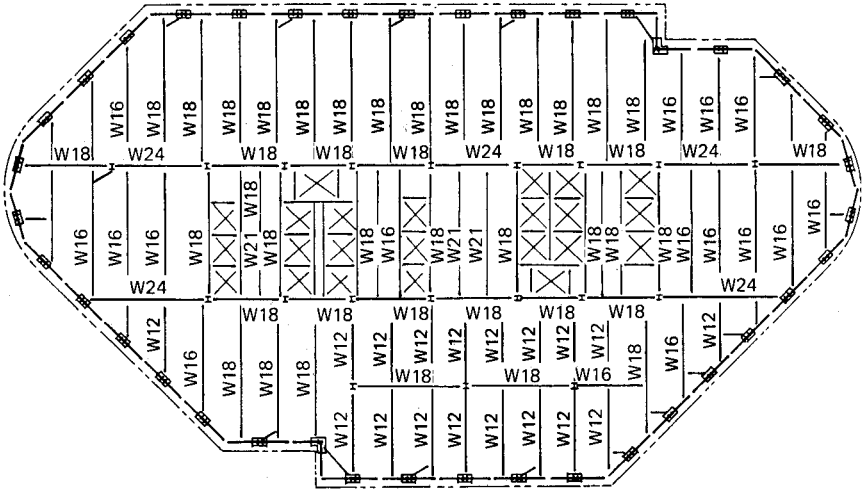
Floor framing plan with 10-ft beam spacings, 2-in deck + $3\frac{1}{4}$ -in slab.
